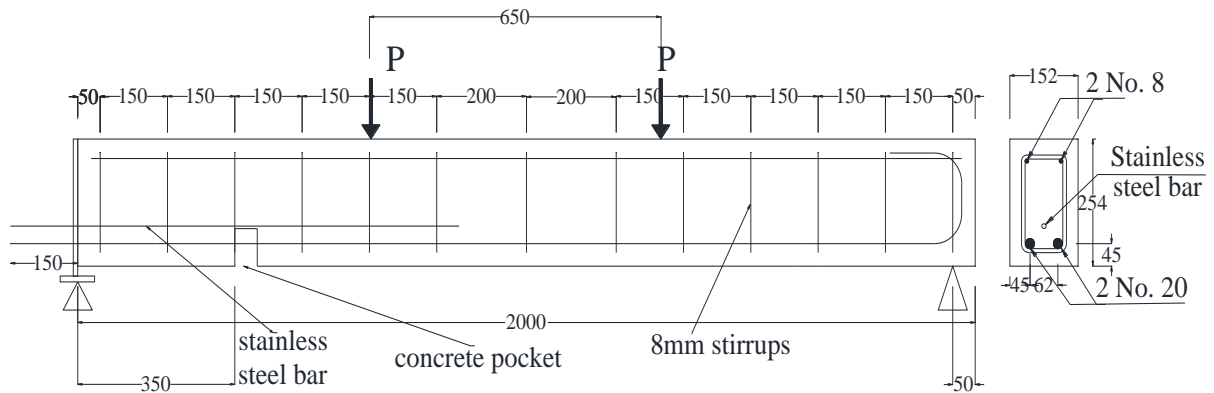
Beams with stirrup configuration A; 150 mm spacing between stirrups in the shear zone. All dimensions are in mm.
